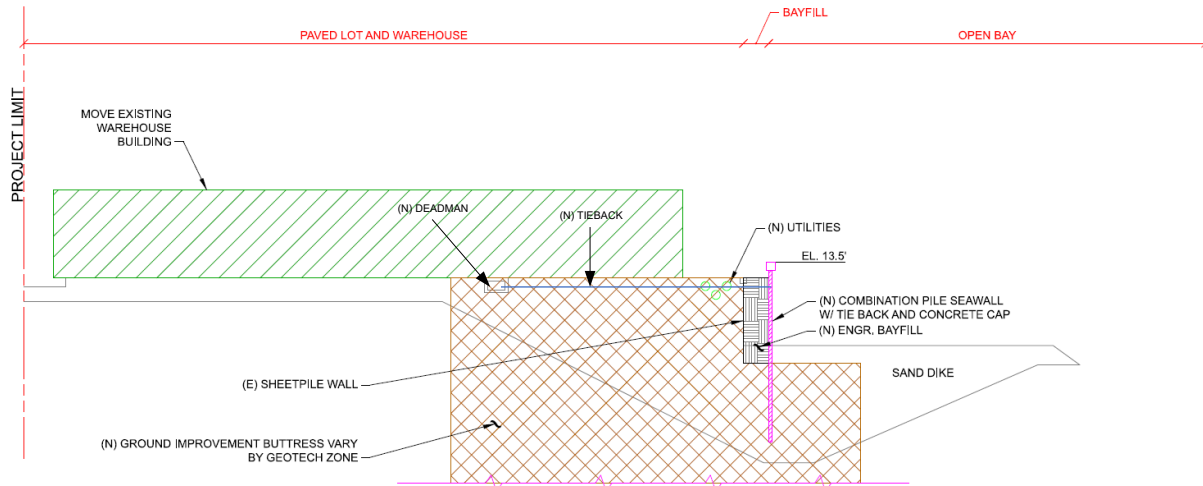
Section 16 Recommended Plan (Reach 4, Pier 94 Wetlands)
